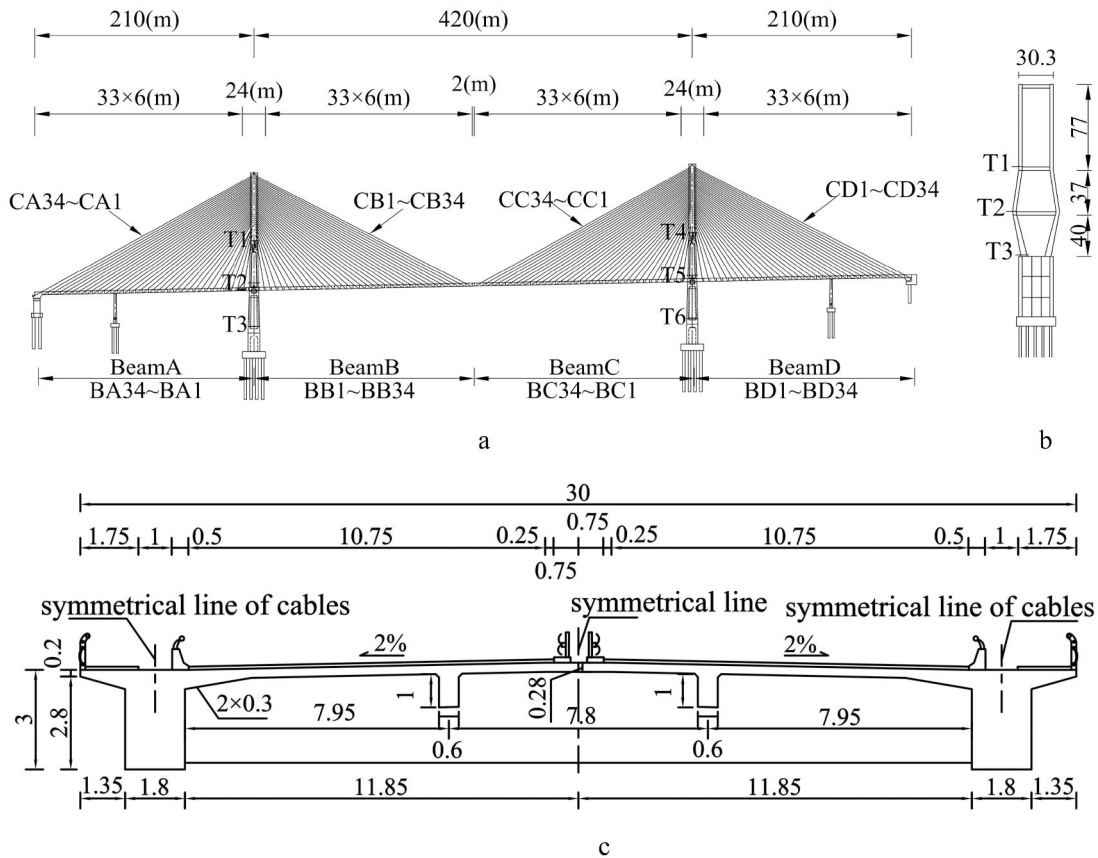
General layout of the bridge (units: m): (a) elevation view; (b) cross-section of bridge tower; (c) cross-section of main girder.
